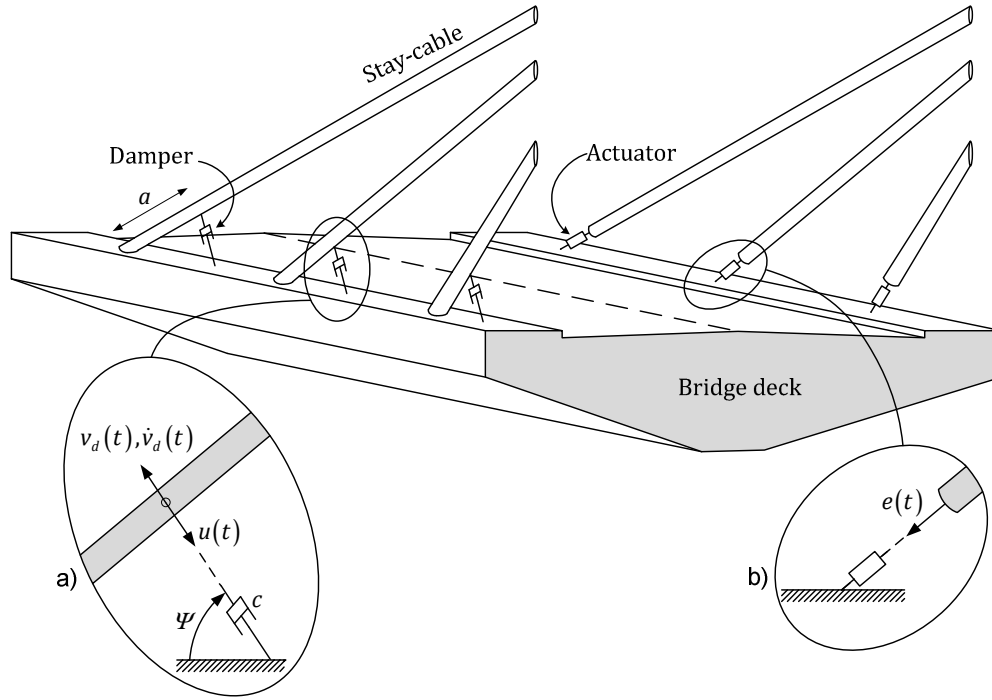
Damping mechanisms installed on a cable stayed bridge.
